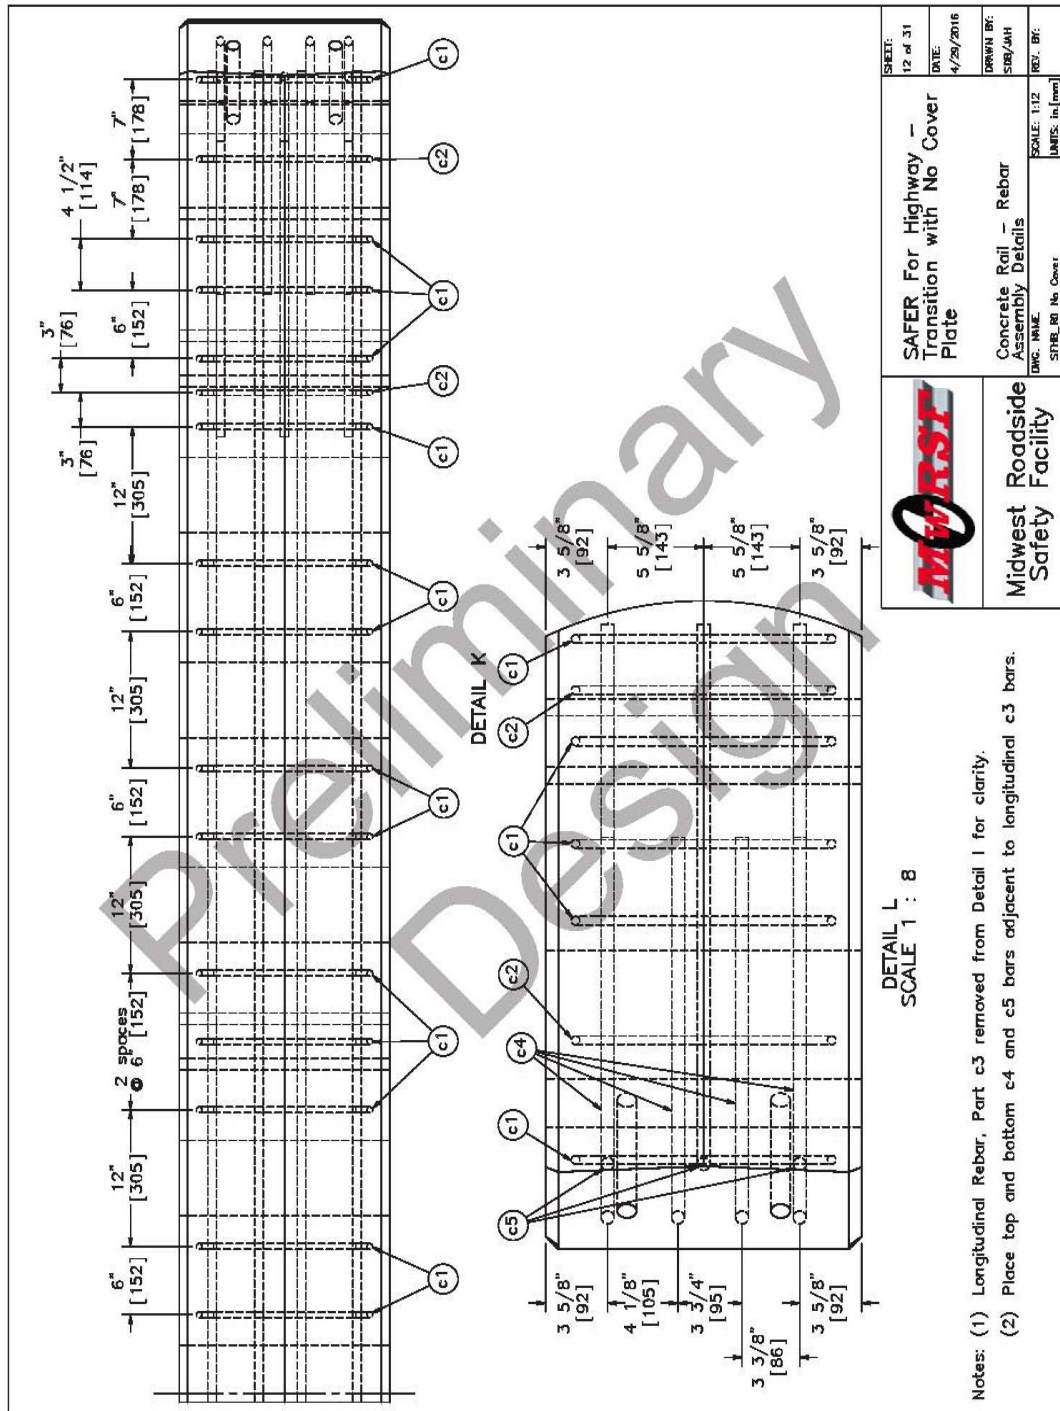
Concrete Rail Rebar Assembly Details, No Cover Plate, RESTORE Barrier Transition
